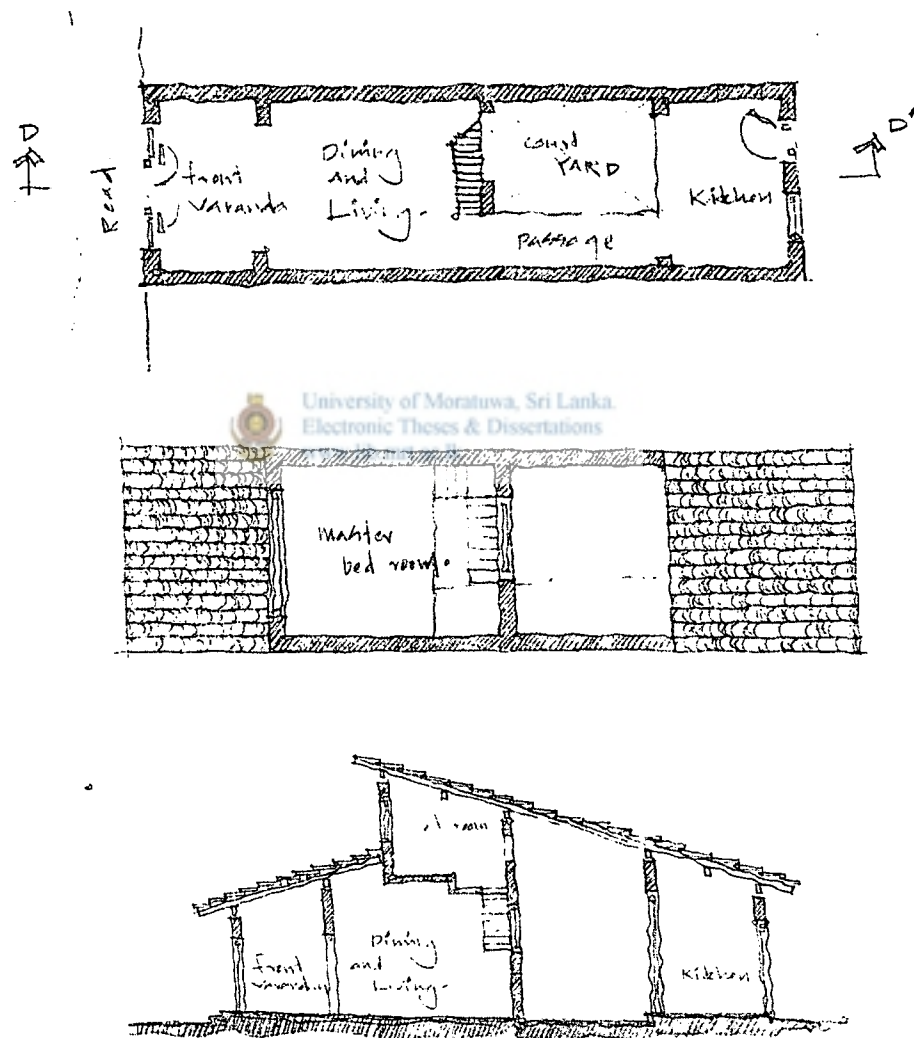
a) , b) and c) : ground floor plan, upper floor plan and section of House- 5. only changes done are the covering up of the courtyard and changing the ladder to a staircase.
